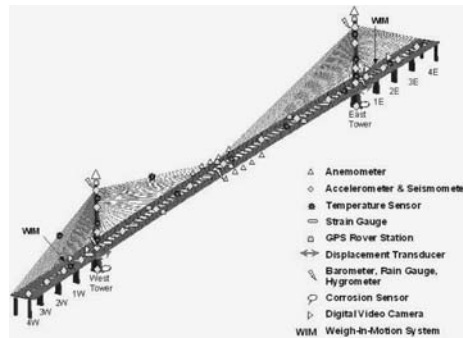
Layout of the sensory systems to be installed on Stonecutters Bridge.
